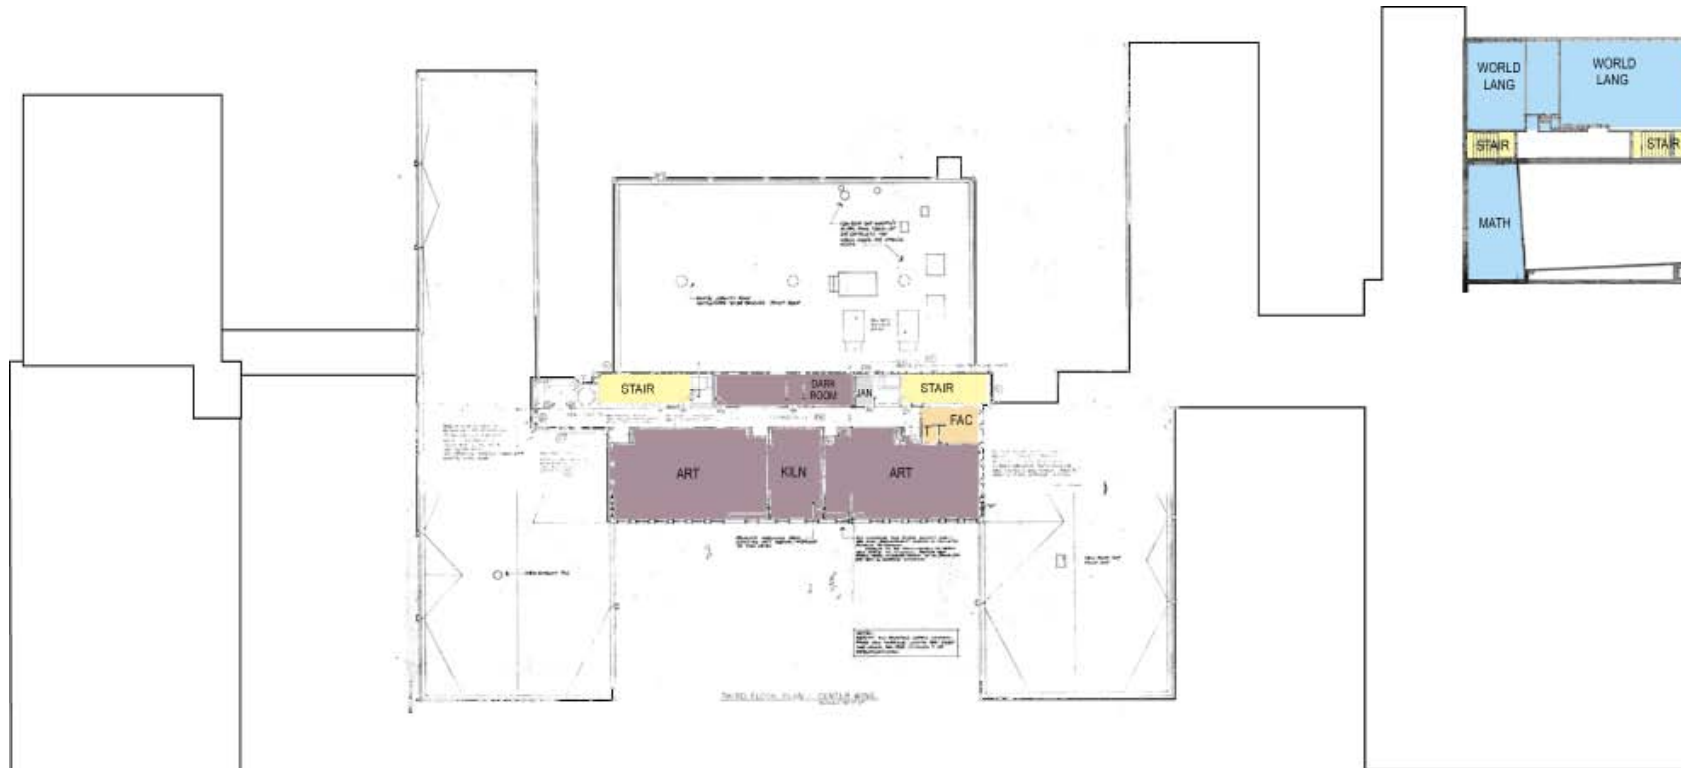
ALLEGANY HIGH SCHOOL THIRD FLOOR PLAN
